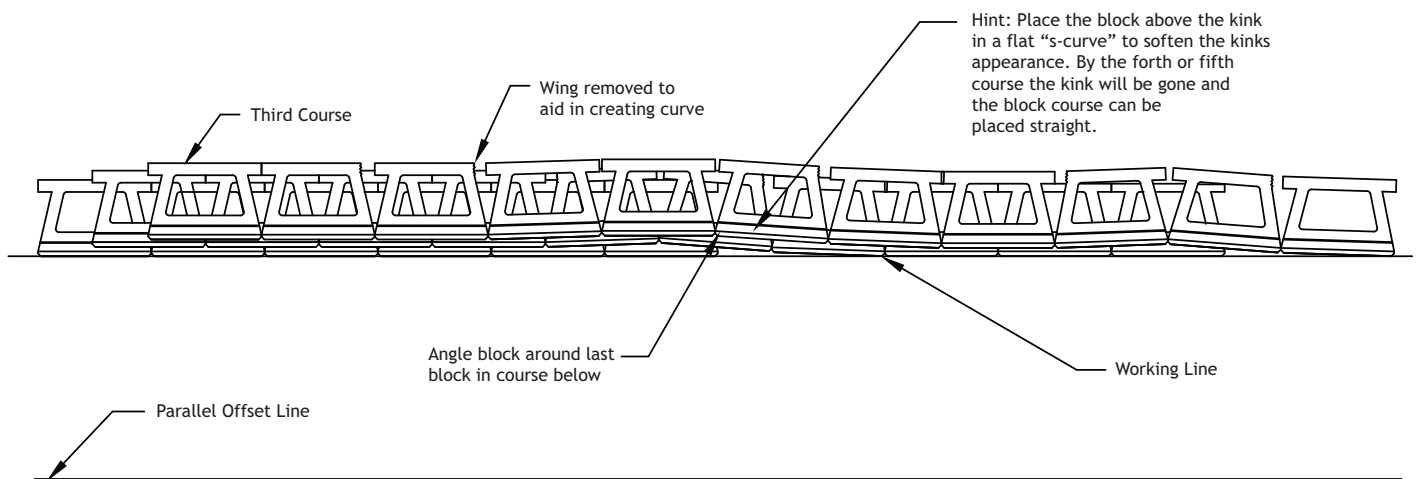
Using a Kink to Build a Straight Wall – Building the Third Course the Second Course
